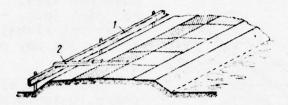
Rib-plank enclosure to lay out vertical elevations of precast pavements.
